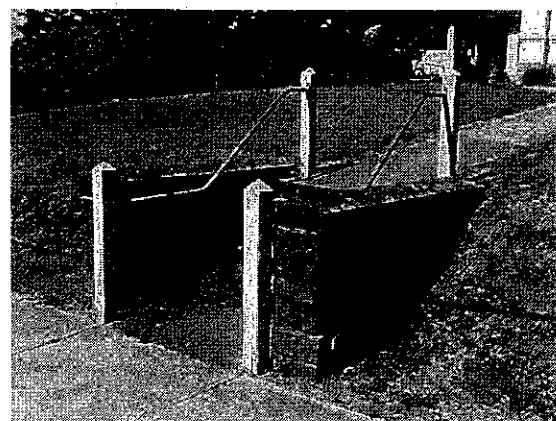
Detail of bluestone steps and retaining wall on the Camp Street frontage
